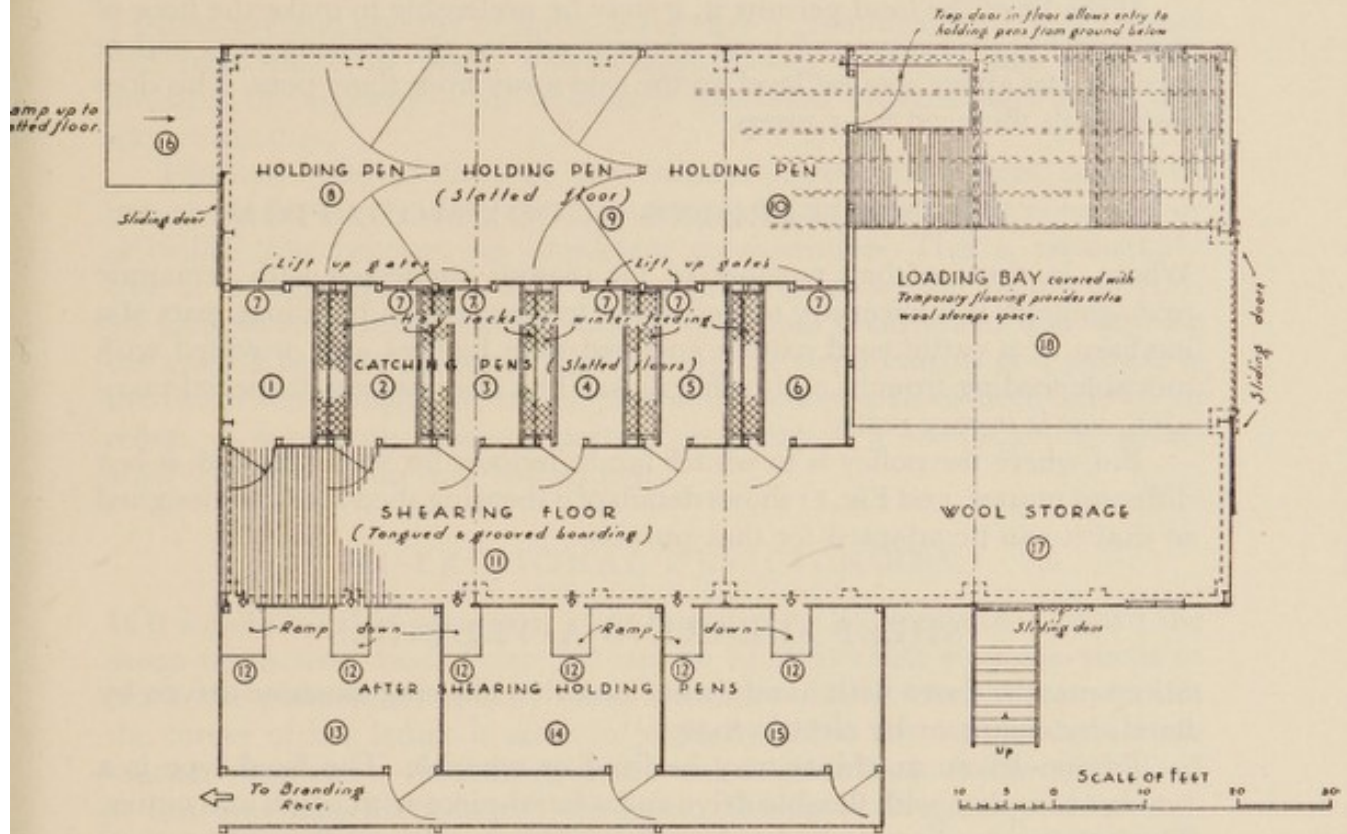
Layout of sheep shearing shed adaptable for wintering lambs
